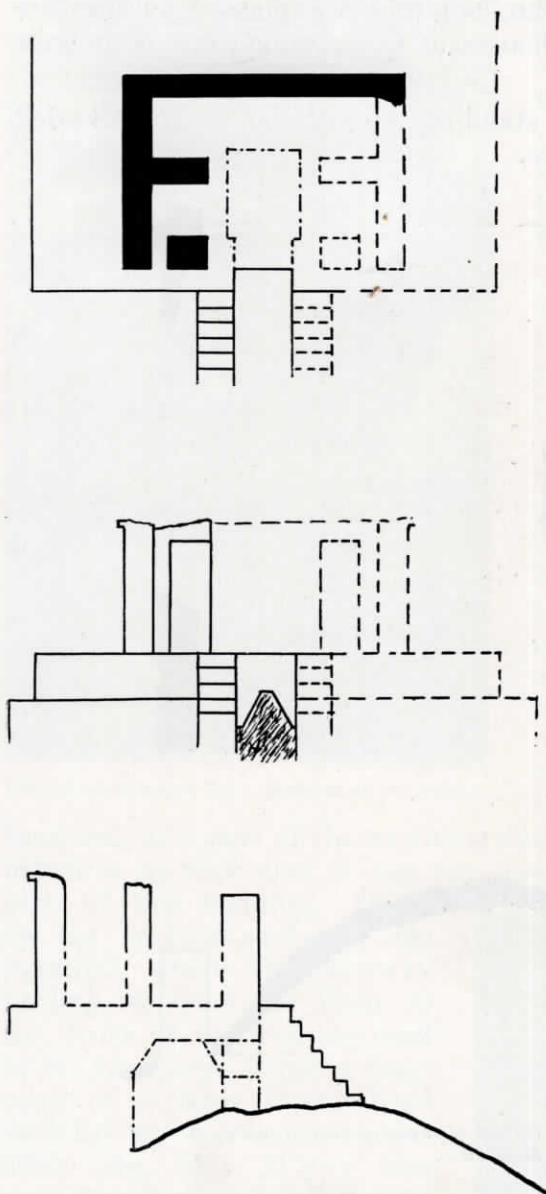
Comalcalco, Tab. Ground plan and section of Temple 1. Scale 1:200.
